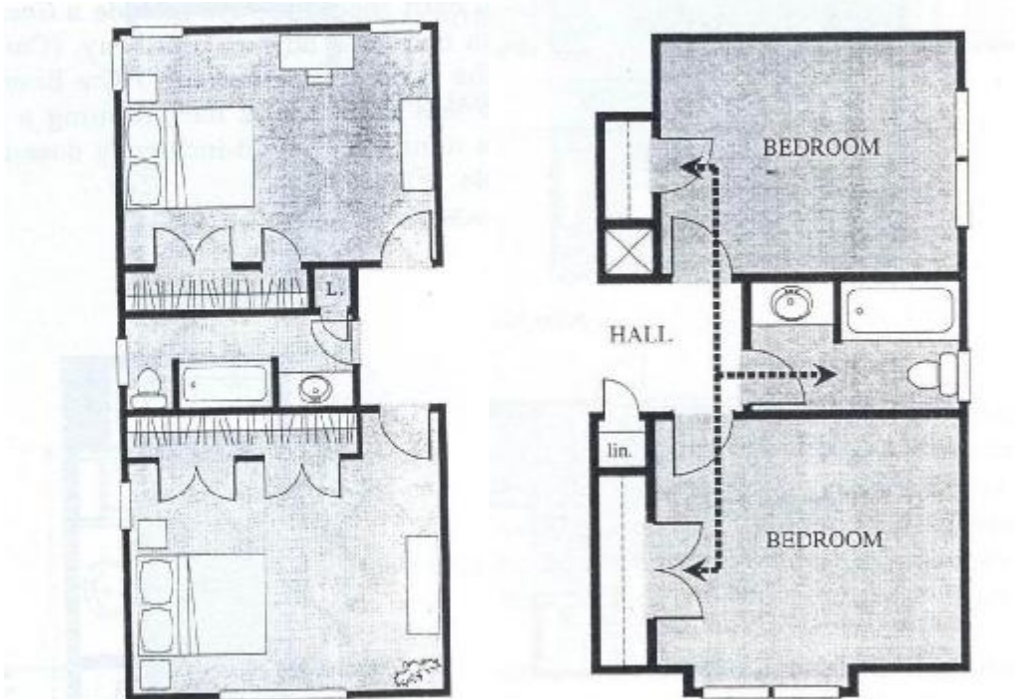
shows that bathrooms should be located so that they are near the entry door to minimize cross circulation
